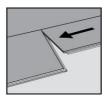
Second plank, second row place the plank at an angle into the groove of the previous row making sure that the end of the plank is near the short end of the previous plank. Light hand pressure or a lengthways tap might be required to flush and secure short end join.
